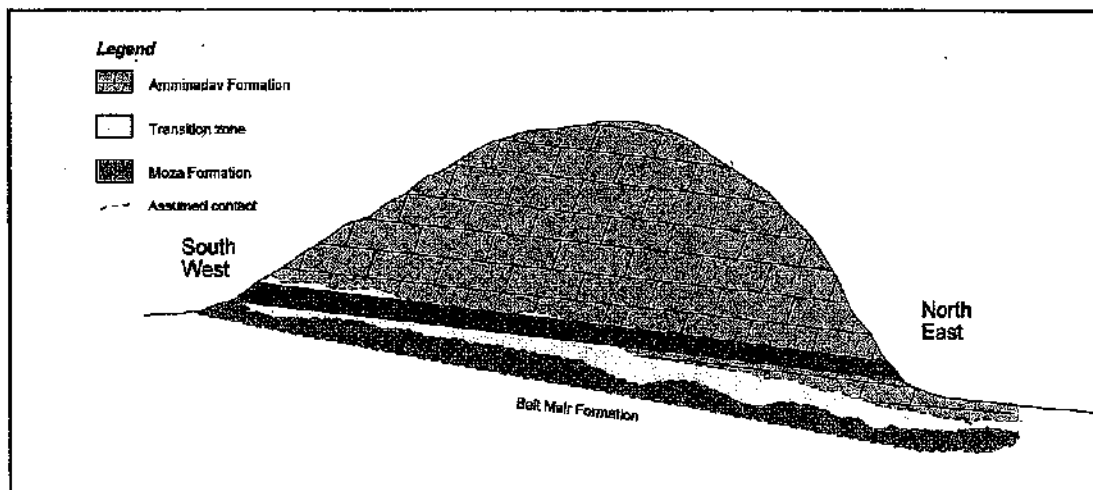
Schematic section of Gilo long tunnel and the stratigraphic penetrated units.
